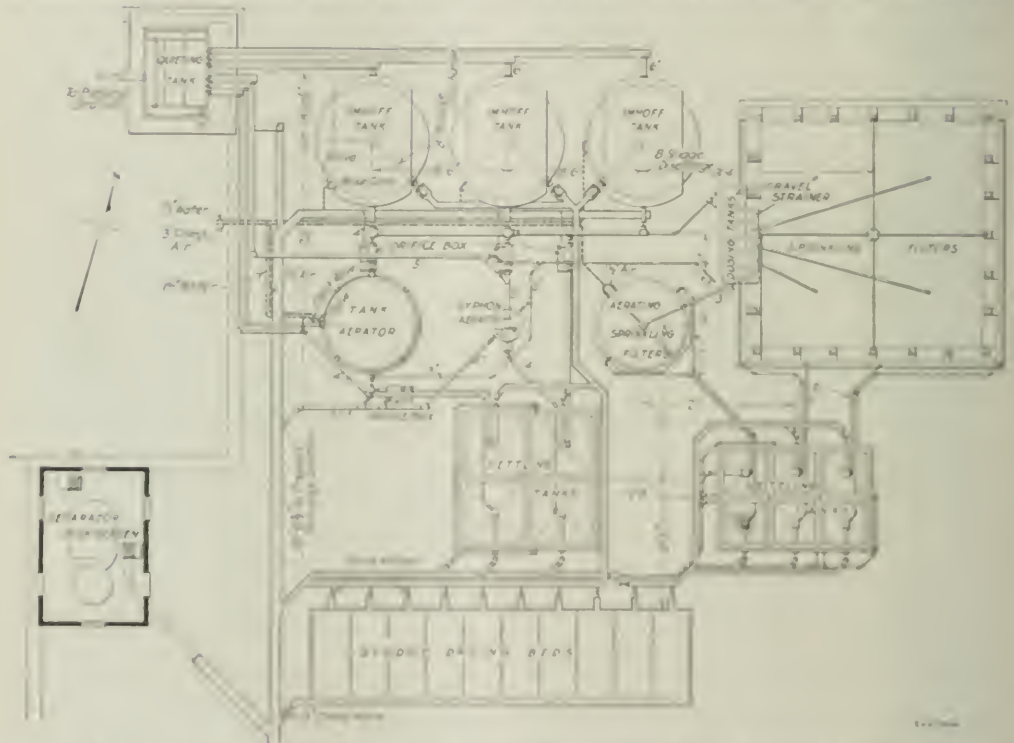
General Plan of Experimental Sewage-Treatment Plant, Borough of Brooklyn, New York City
